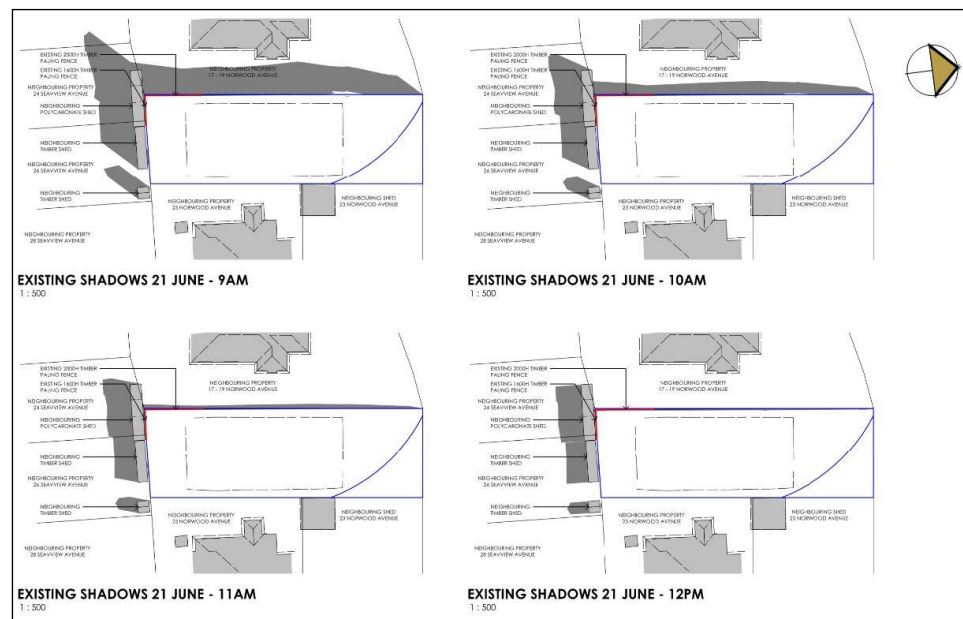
Existing overshadowing caused by the boundary fence and timber structures on the adjoining lots between 9am to 12pm.
